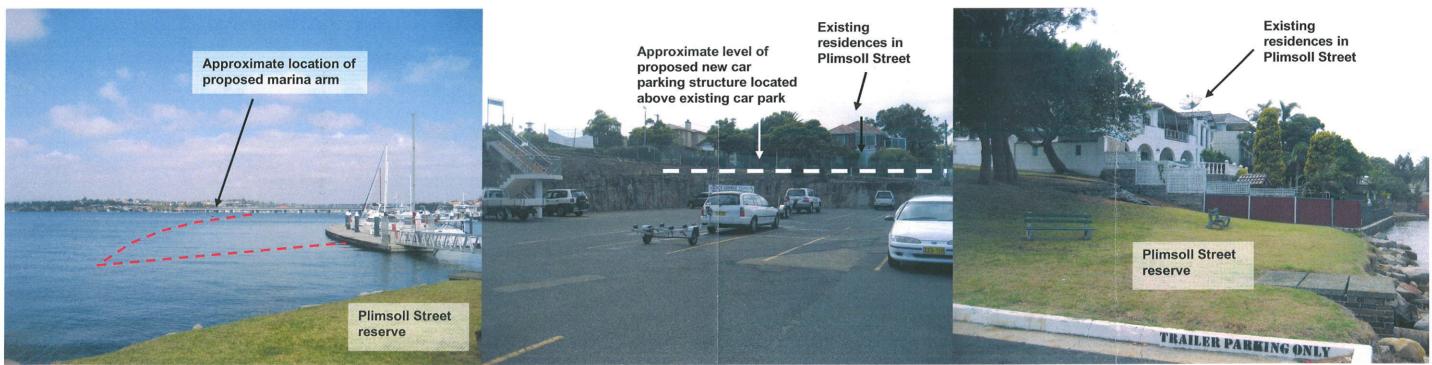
Location of the proposed marina arm (left), proposed car parking structure (middle) and adjoining residential properties in Plimsoll street (middle and right)
